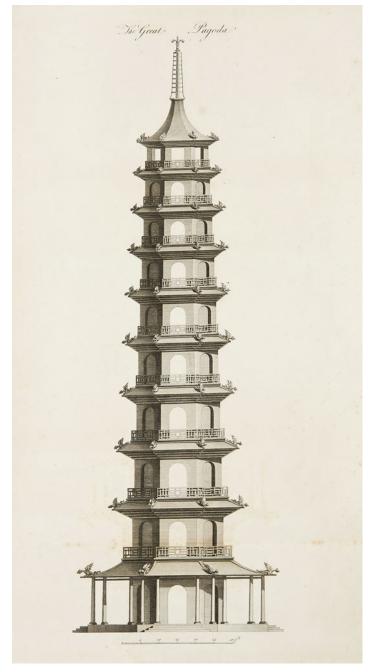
William Chambers (1723–96),* The Great Pagoda, *from* Plans, Elevations, Sections and Prospective Views of the Garden Buildings at Kew (*London, 1763*)
